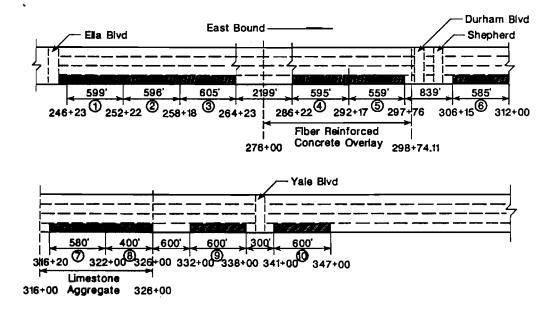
Plan view and locations of the 10 test sections, east bound IH 610 North, Houston.
